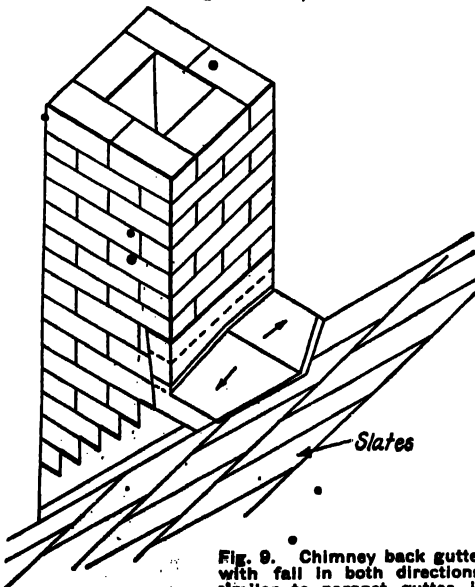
Chimney back gutter with fall in both directions, similar to parapet gutter in Figs. 6 and 7, with chimney side gutter as in Fig. 6.
